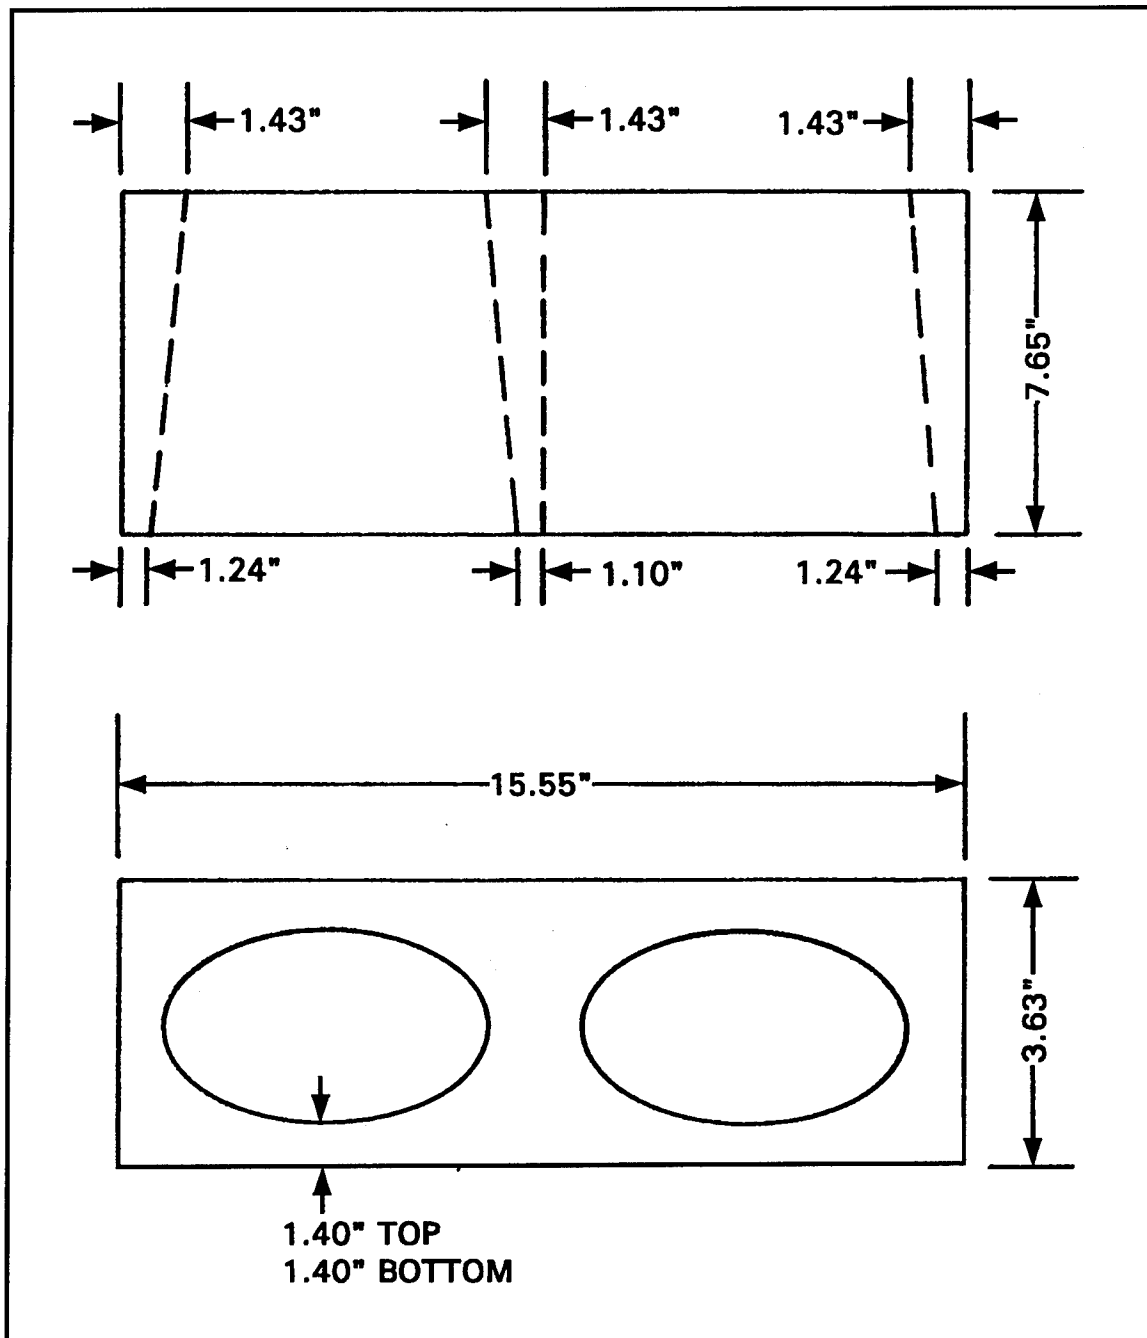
Typical elevation and cross section of 4-in. concrete masonry unit
